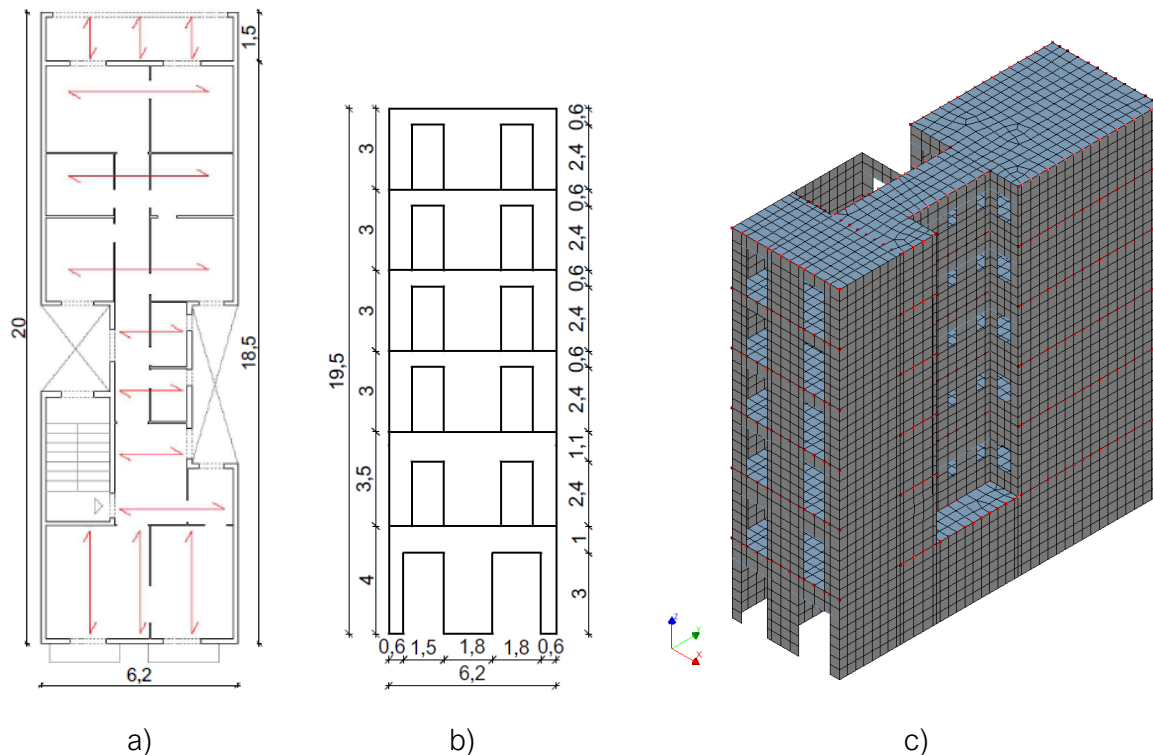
Geometrical configuration of a representative narrow building model with lateral staircase and patios (in metres): a) Floor plan section; b) Front façade geometry; c) 3D finite element model.
